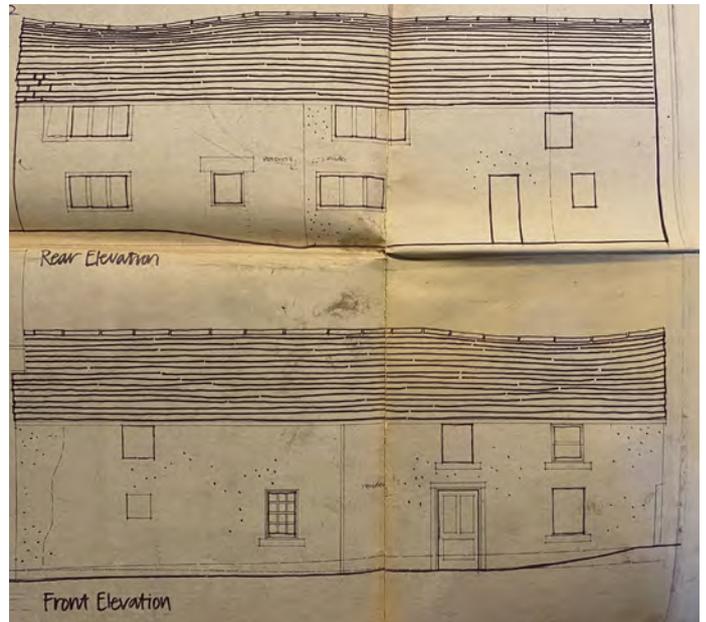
'Existing' elevations (before works) by Design Cooperative Architects of Manchester, dated June 1981
